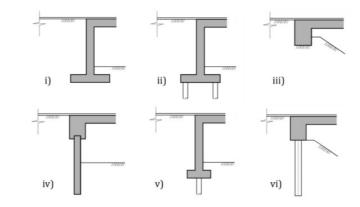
Types of integral abutment bridges: i) full height integral abutment on pad footing; ii) full height integral abutment on piles; iii) bank pad; iv) embedded wall integral abutment; v) full height integral abutment on single row of piles; vi) bank pad on single row of piles. Other types are possible
